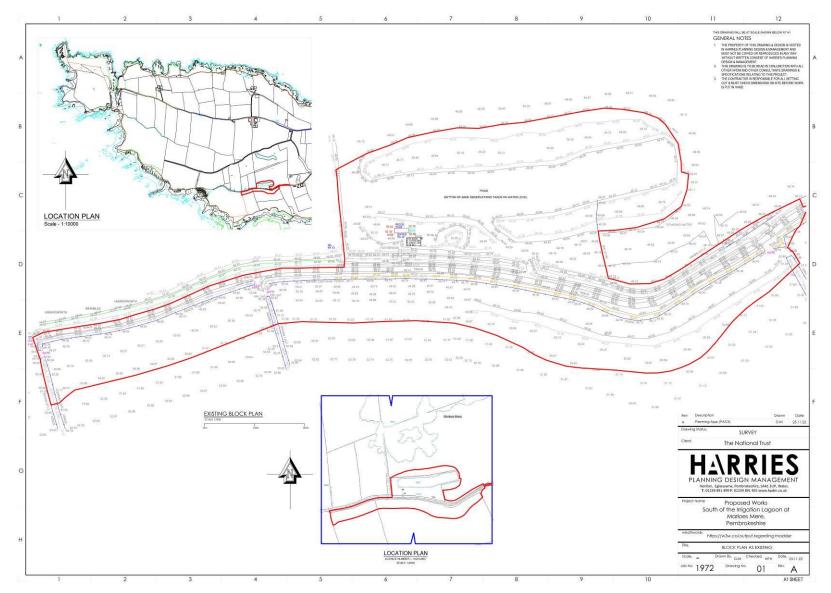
Detailed site and development location plan. Plan provided by the client, not reproduced to original scale.
